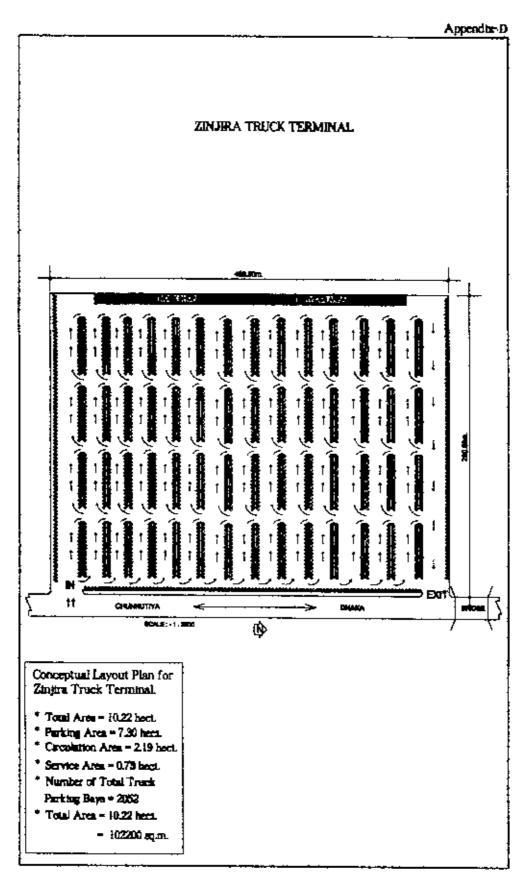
Conceptual Layout Plan for Zinjira Truck Terminal
